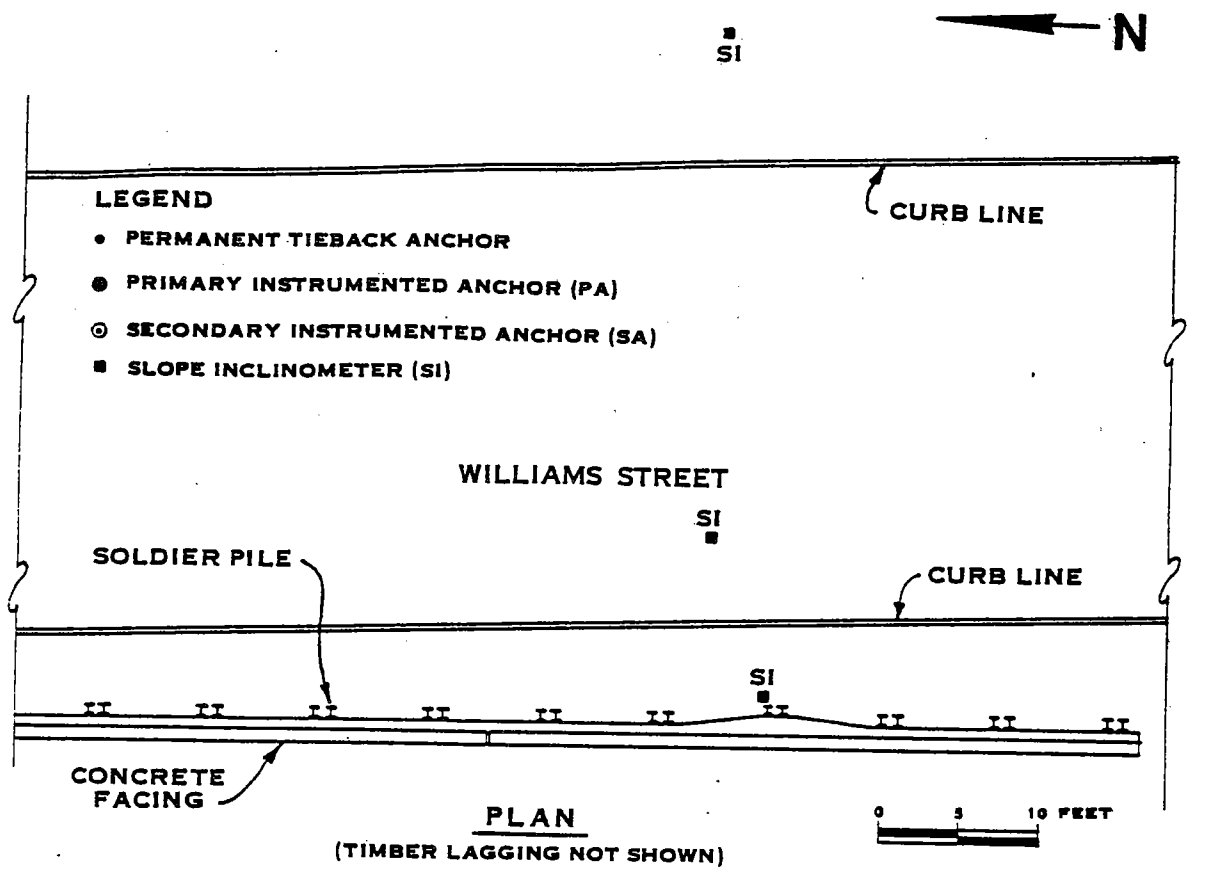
PERMANENT TIEBACK WALL INSTRUMENTATION
